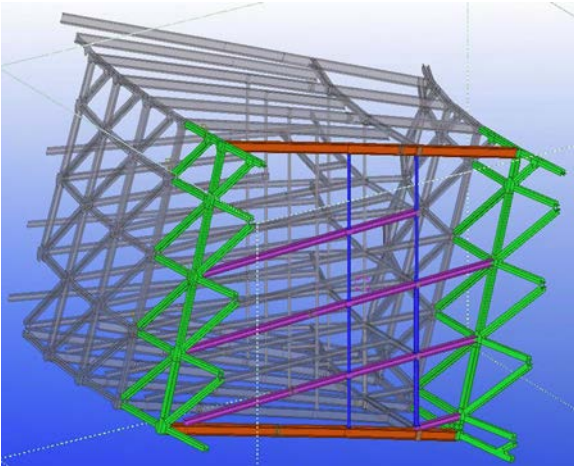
Radial cross-section of the 3D model of the steel structure. The box girder section formed by the façade trusses (green in the diagram) and the bottom and roof structural slabs (orange for beams) is stiffened by diaphragms consisting in the inter-storey beams (purple) and inner tubular columns (blue).
